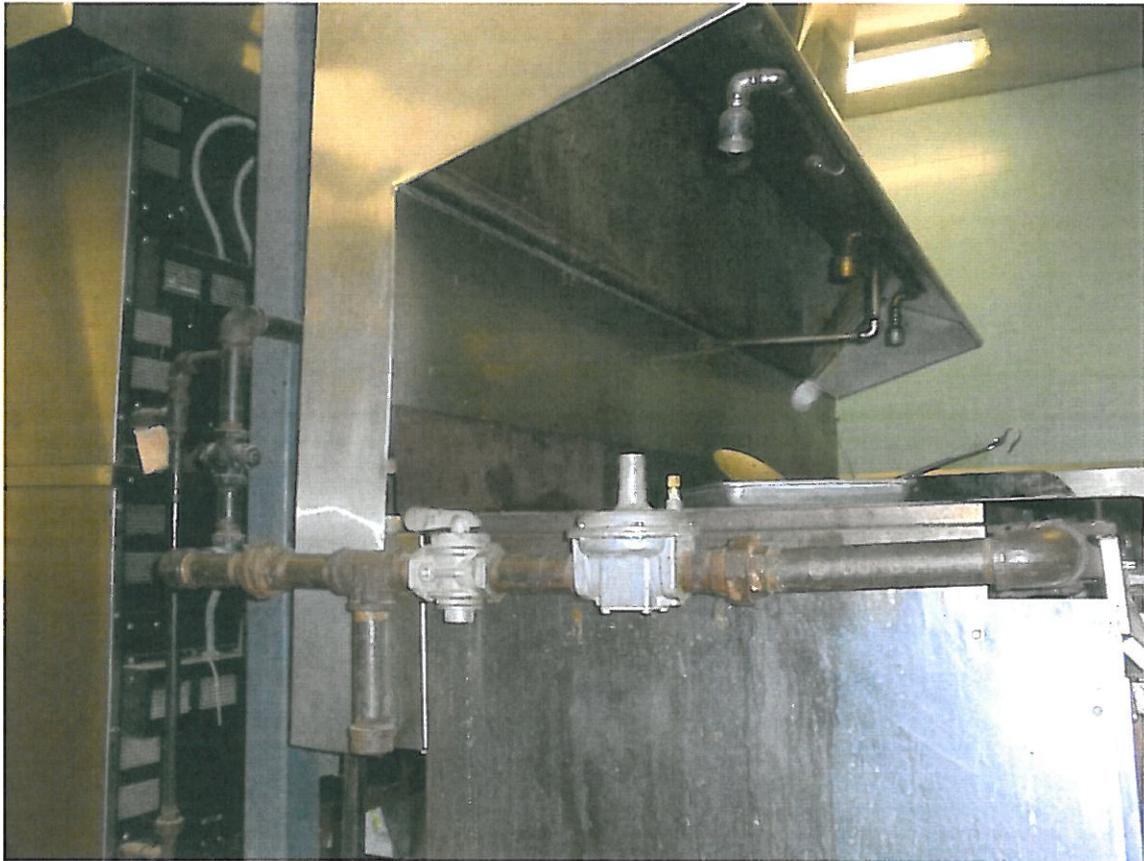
Gas Piping – Left Side; fire protection nozzles
